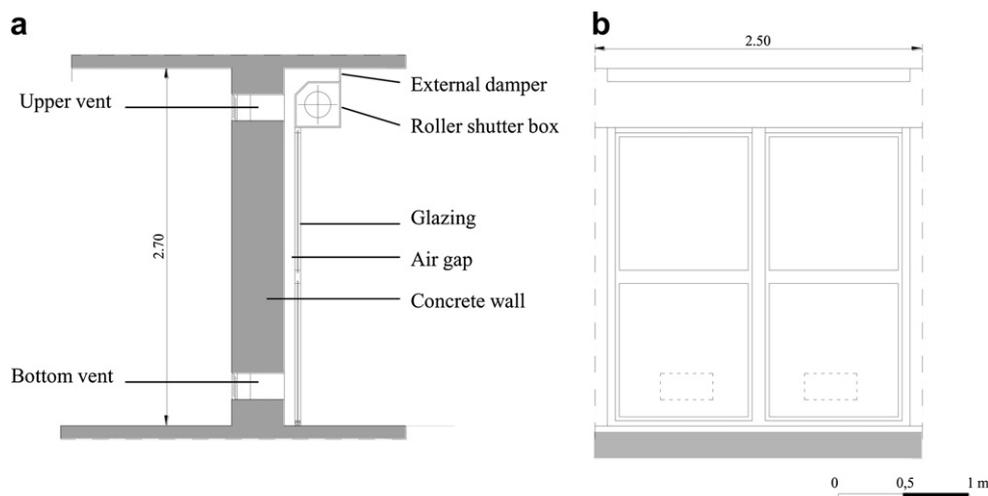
Cross section (a) and front view (b) of the Trombe wall.
